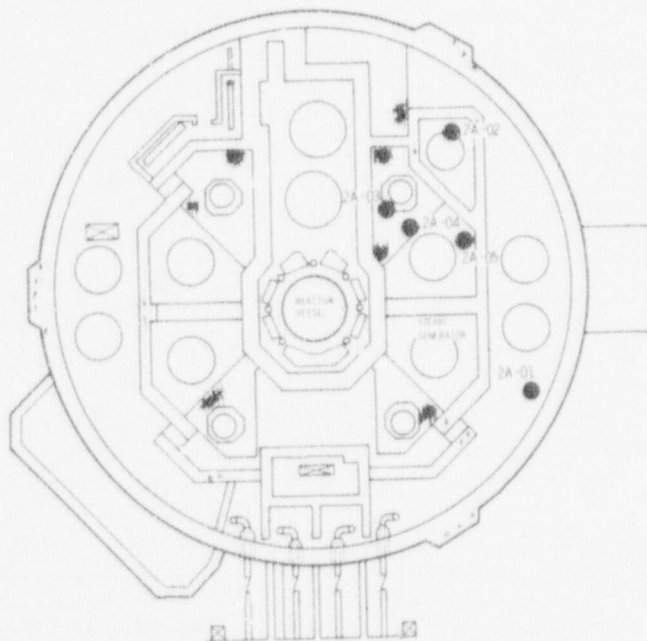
Source Locations in Containment Building At 61-Ft Elevation(10)
